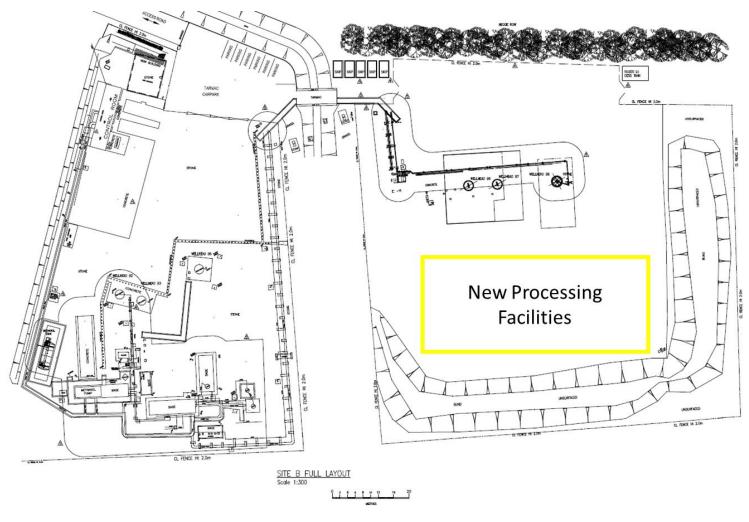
Site B: Existing and Proposed Equipment Layout. Source AEWB
